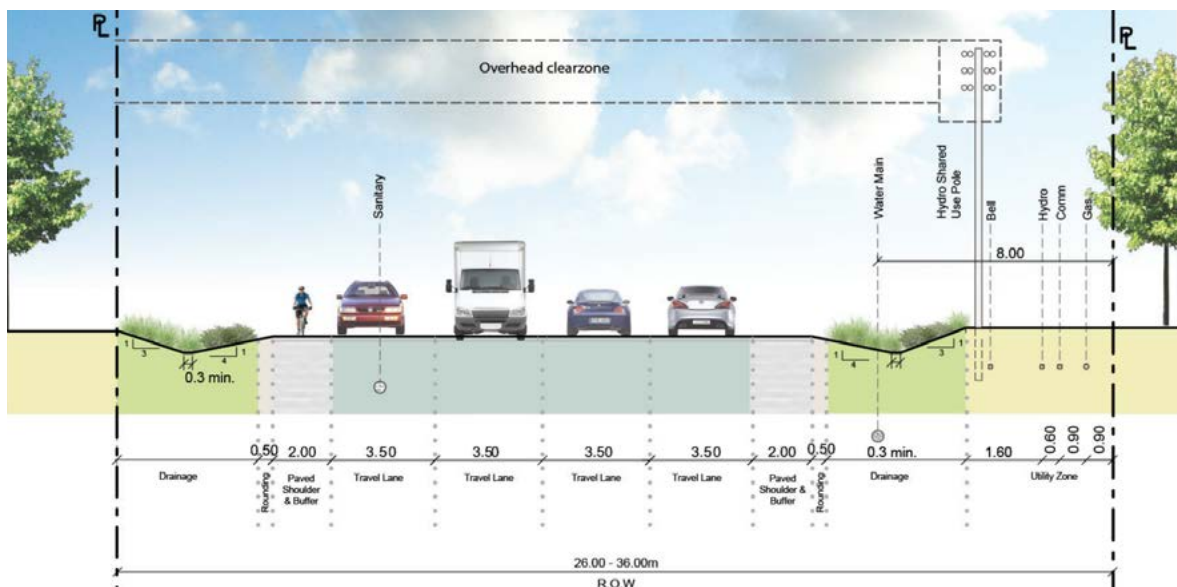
Sample road cross section of the Rural Road typology from DGS Guidelines
